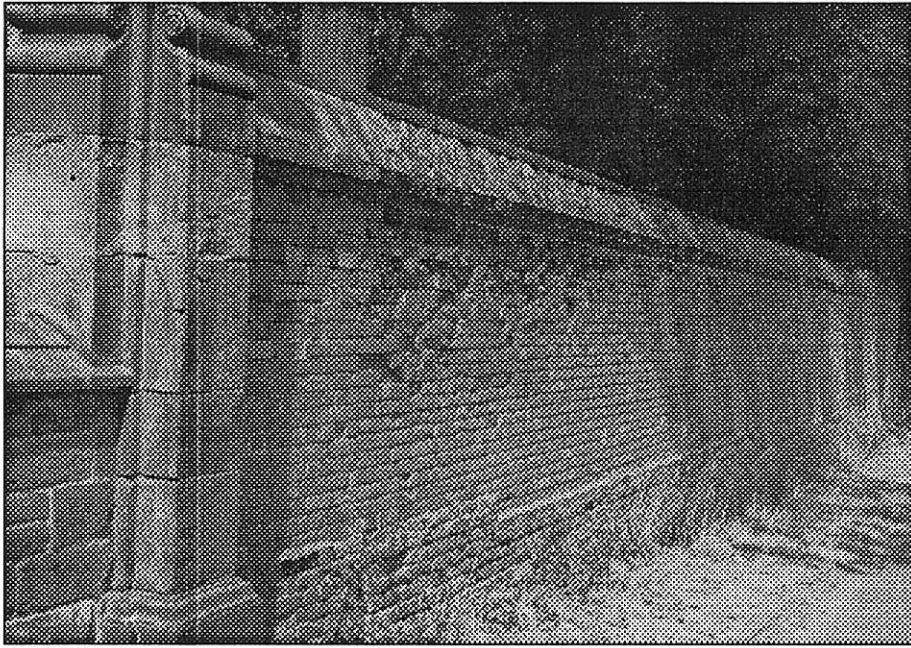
Boundary Wall to Hoar Cross Hall, Maker Lane
